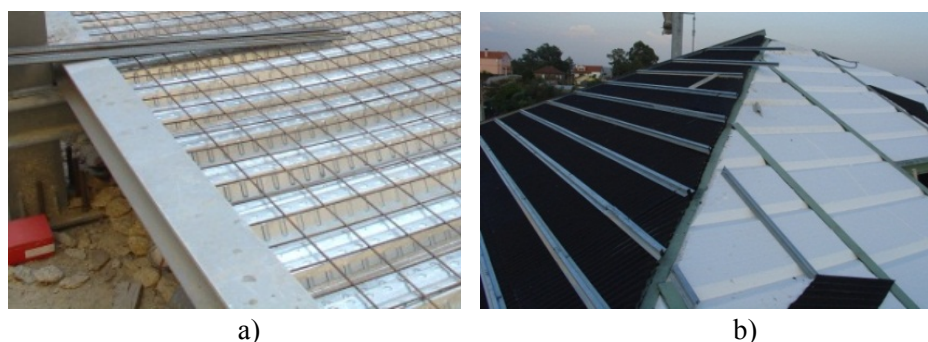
a) Metal steel frame on floors; b) Roof with metal steel beams, insulation and tiles supports
